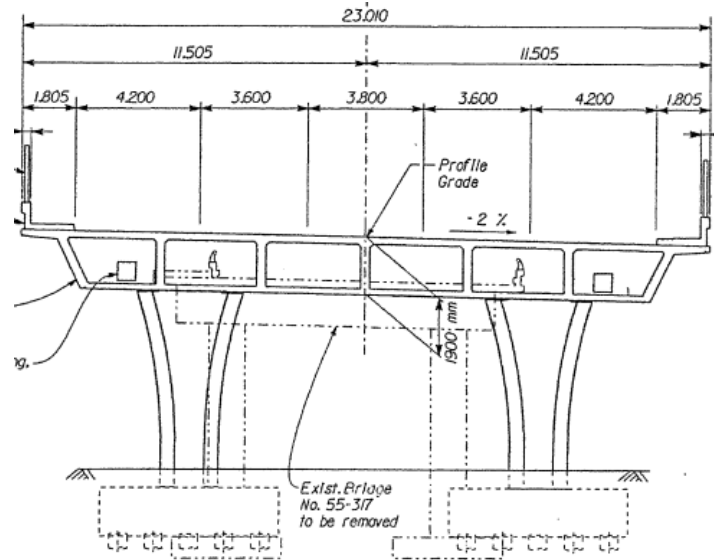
Cross-Section detail of La Veta bridge deck (Caltrans)
